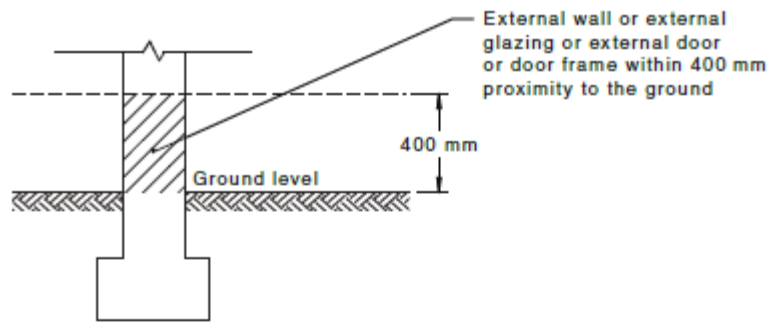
EXTERNAL WALLS OR EXTERNAL GLAZING, OR EXTERNAL DOORFRAMES WITHIN LIMITS ABOVE GROUND, DECKS, CARPORT ROOFS
